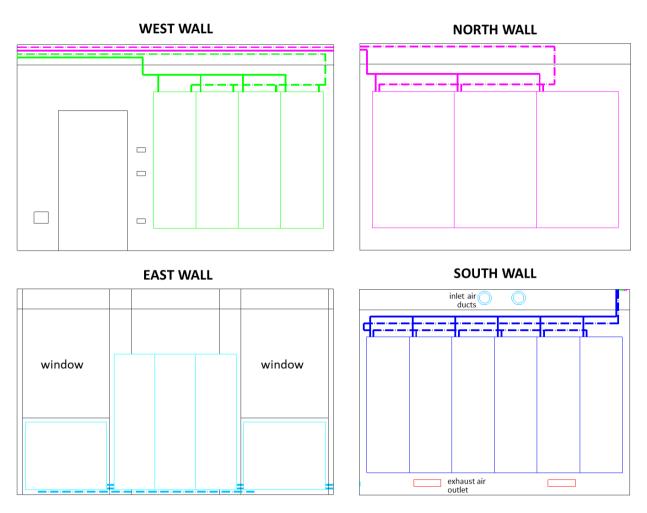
Layout and hydronic connections of the radiant panels on the walls.
